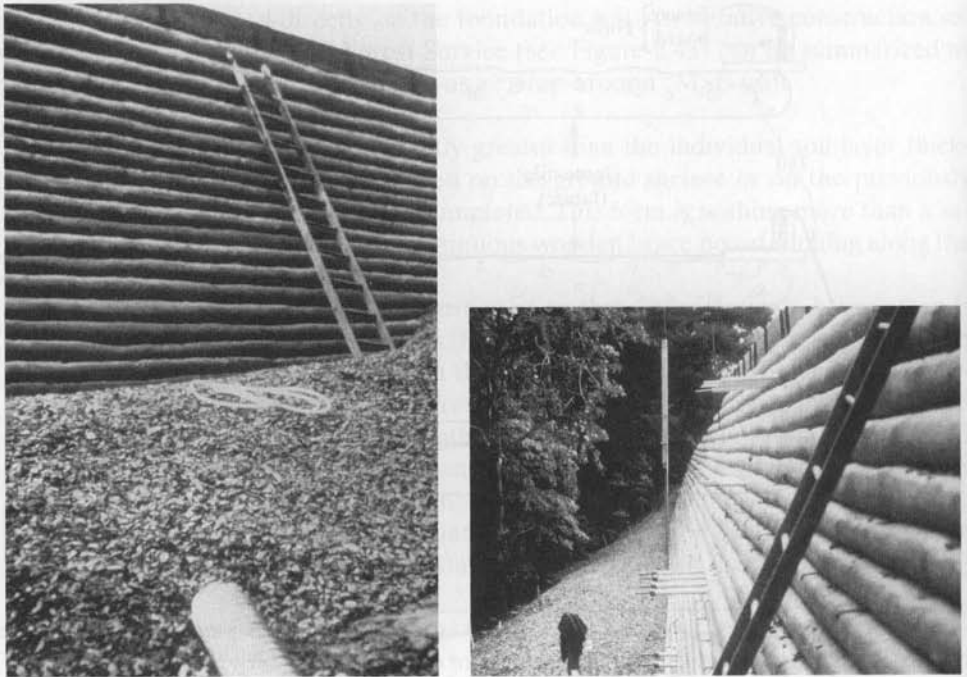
Geotextile wrap-around walls. (Compliments of Crown Zellerbach Corp.)
